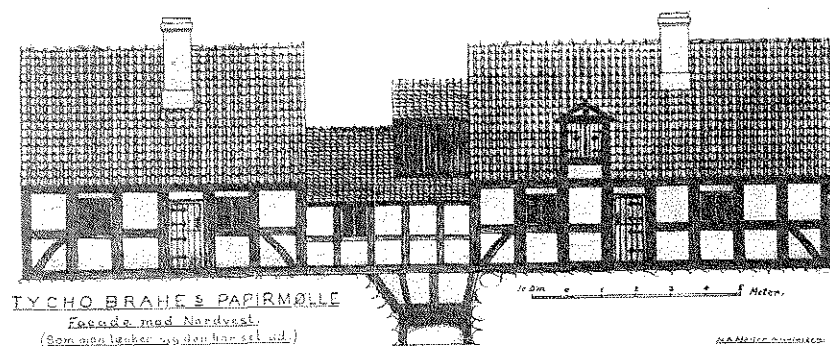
Møller Nicolaisen was also able to give an account of the exterior of the building. Many of the reconstruction's suggestions for individual solutions must, of course, be seen in connection with the reconstruction of the ground plan. – Text in box: Tycho Brahe's paper mill. North-west façade, as we imagine it.
